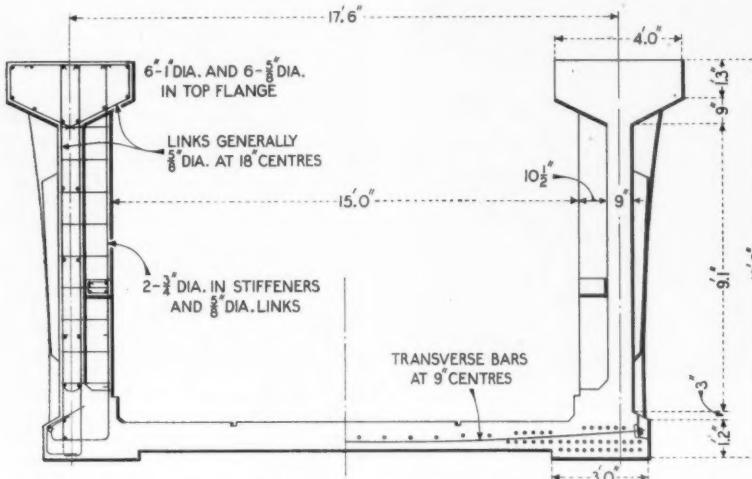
Section through deepest parts of girders showing position of reinforcing bars
